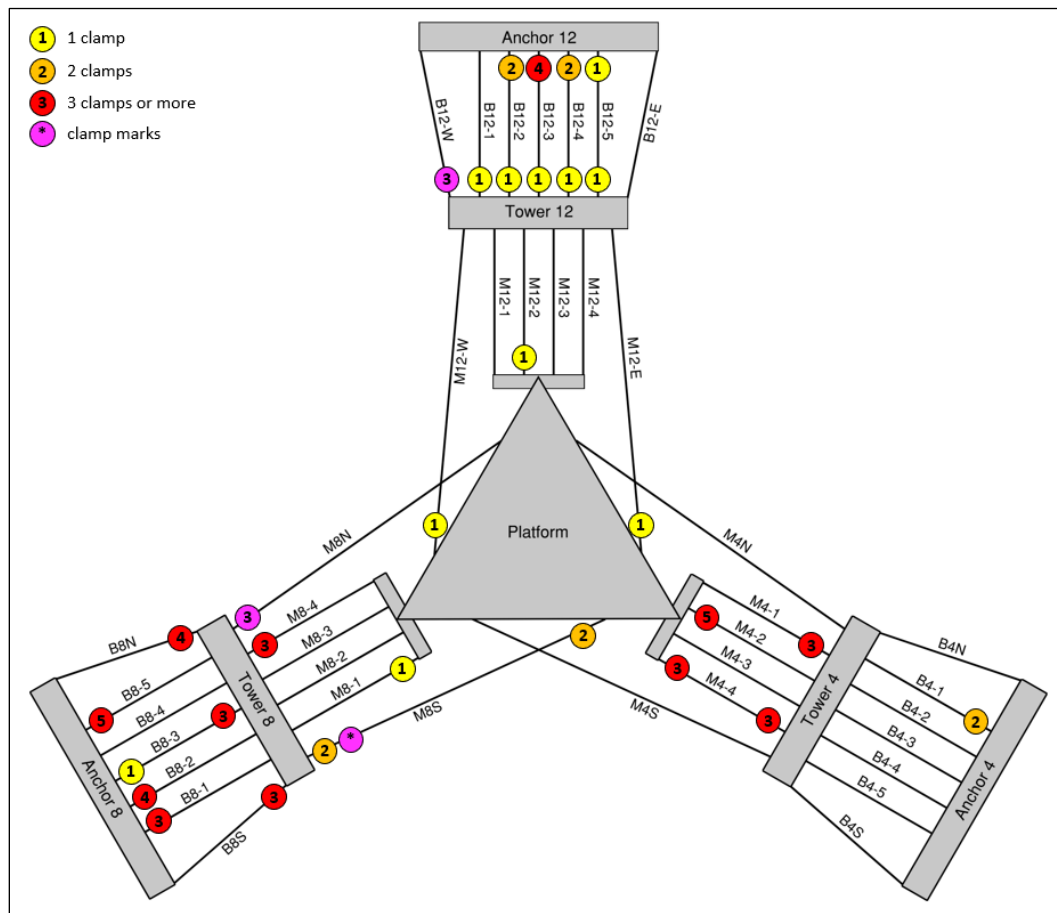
Cable clamps and clamp marks observed after first cable failure.
